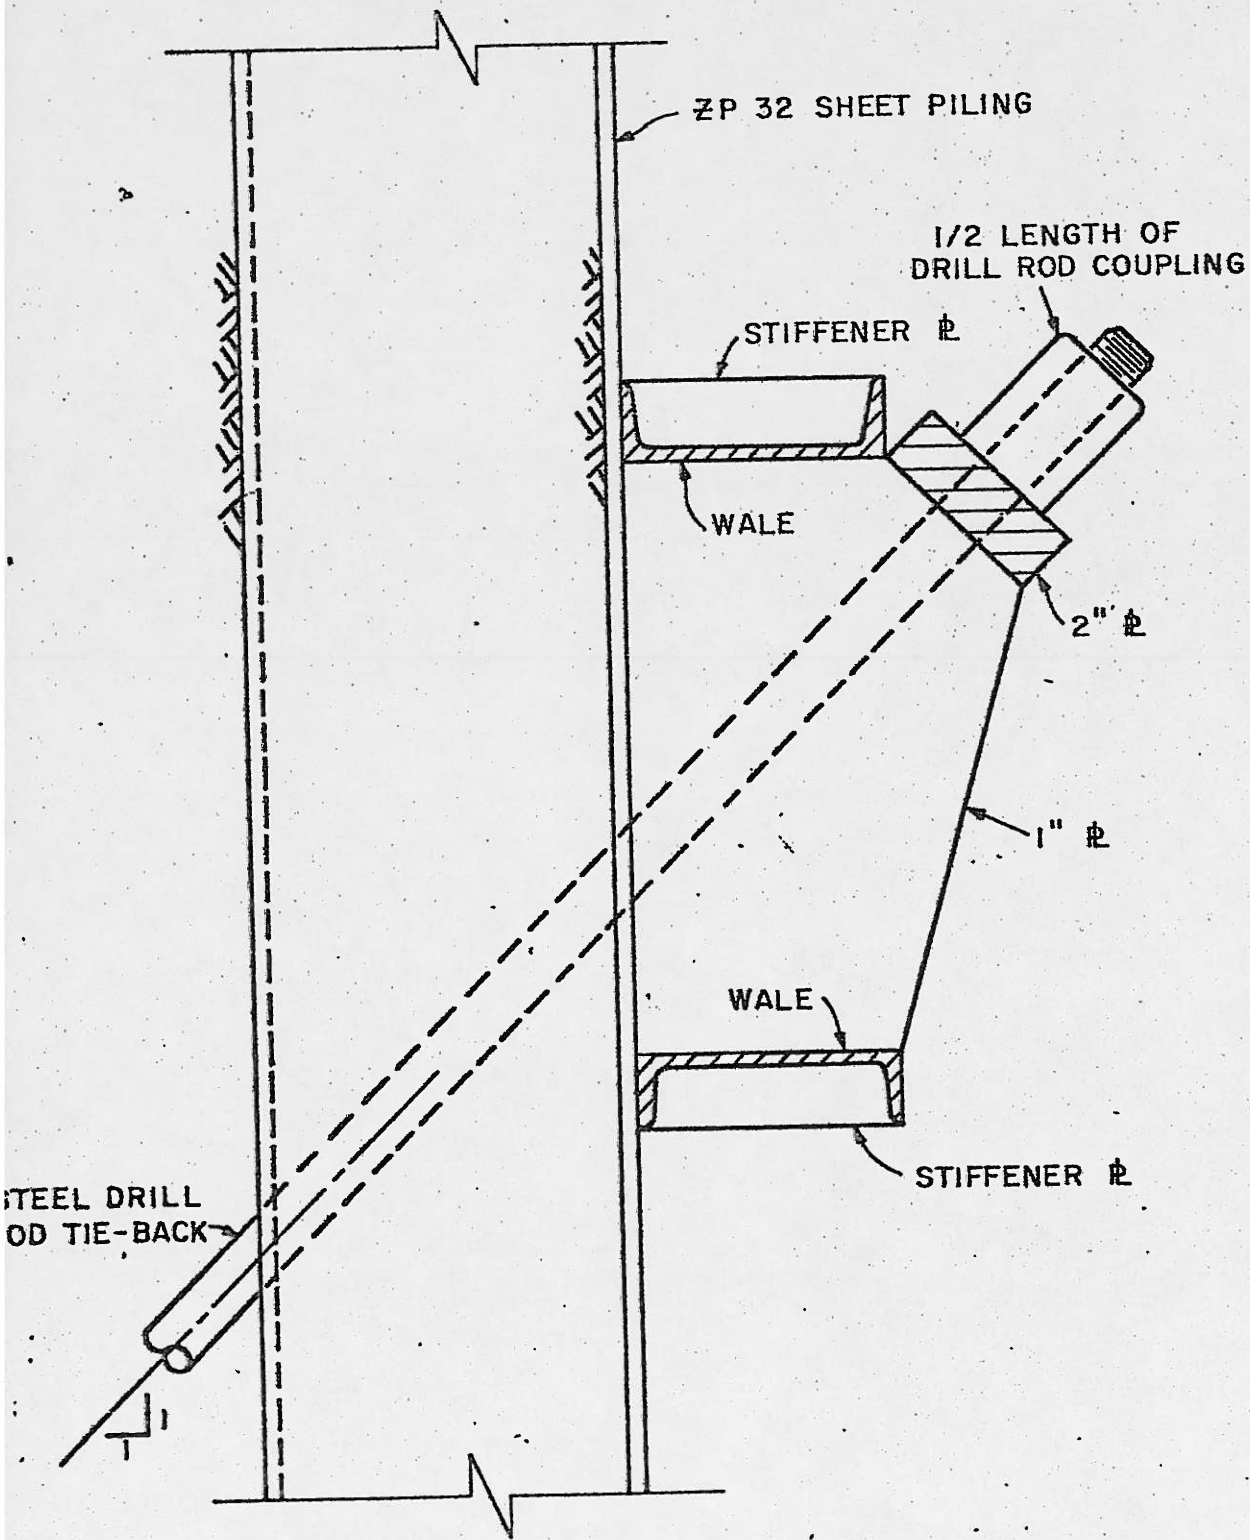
DETAIL OF DRILL ROD TIE-BACK TO WALE CONNECTION
